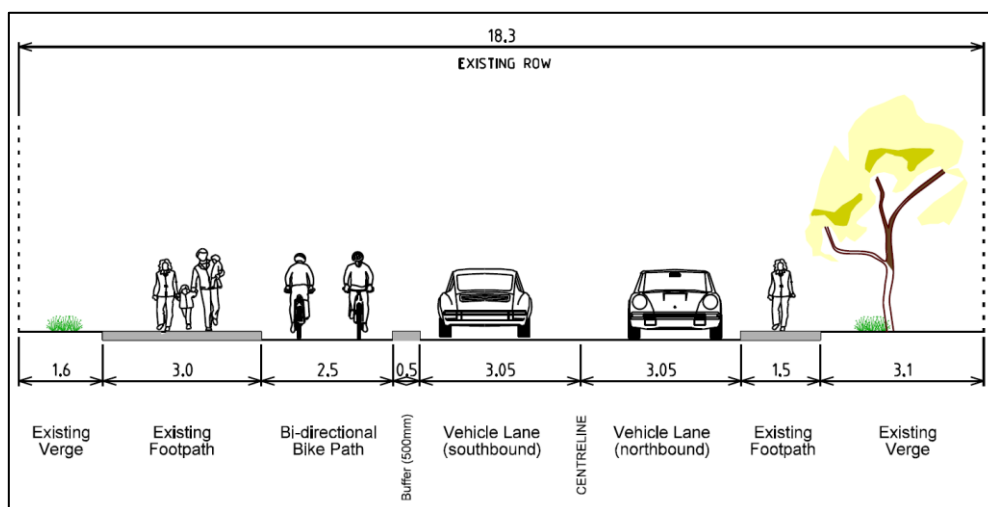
Typical bi-directional cross-section within existing carriageway (Furzer Street)
